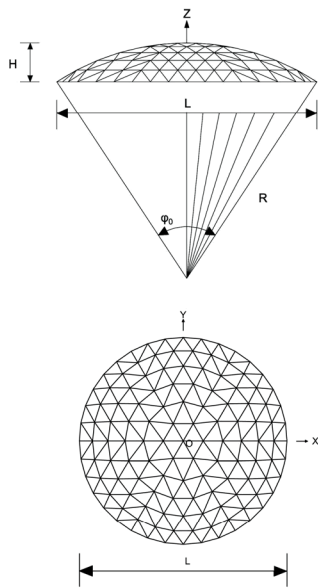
Lattice dome geometry for modeling(elevation and plan)
